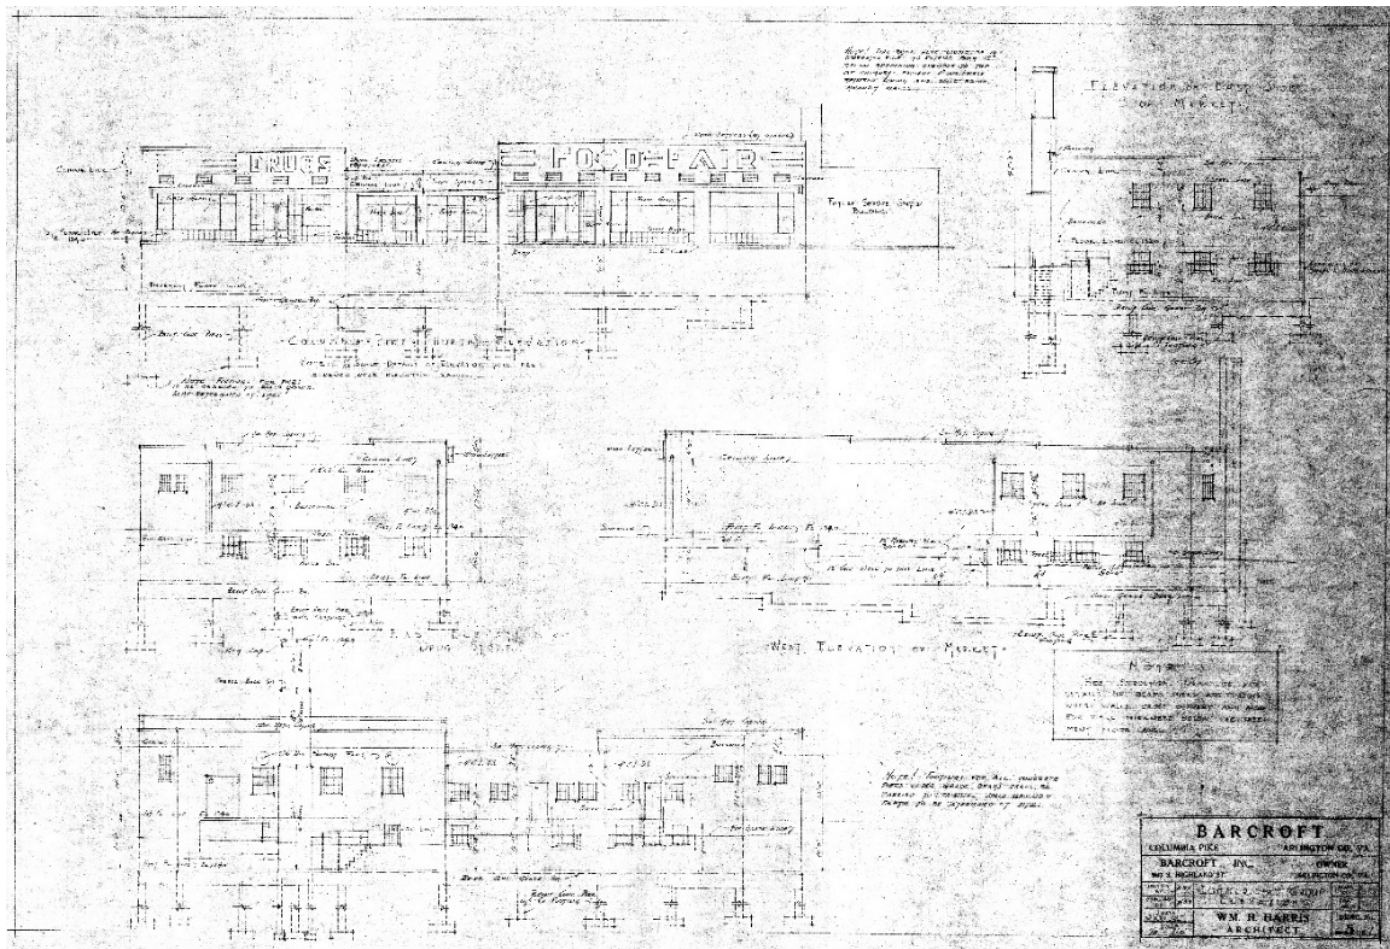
Barcroft Apartments, Commercial Building Elevations, May 30, 1945 by William H. Harris (Barcroft Apartments Archives)
